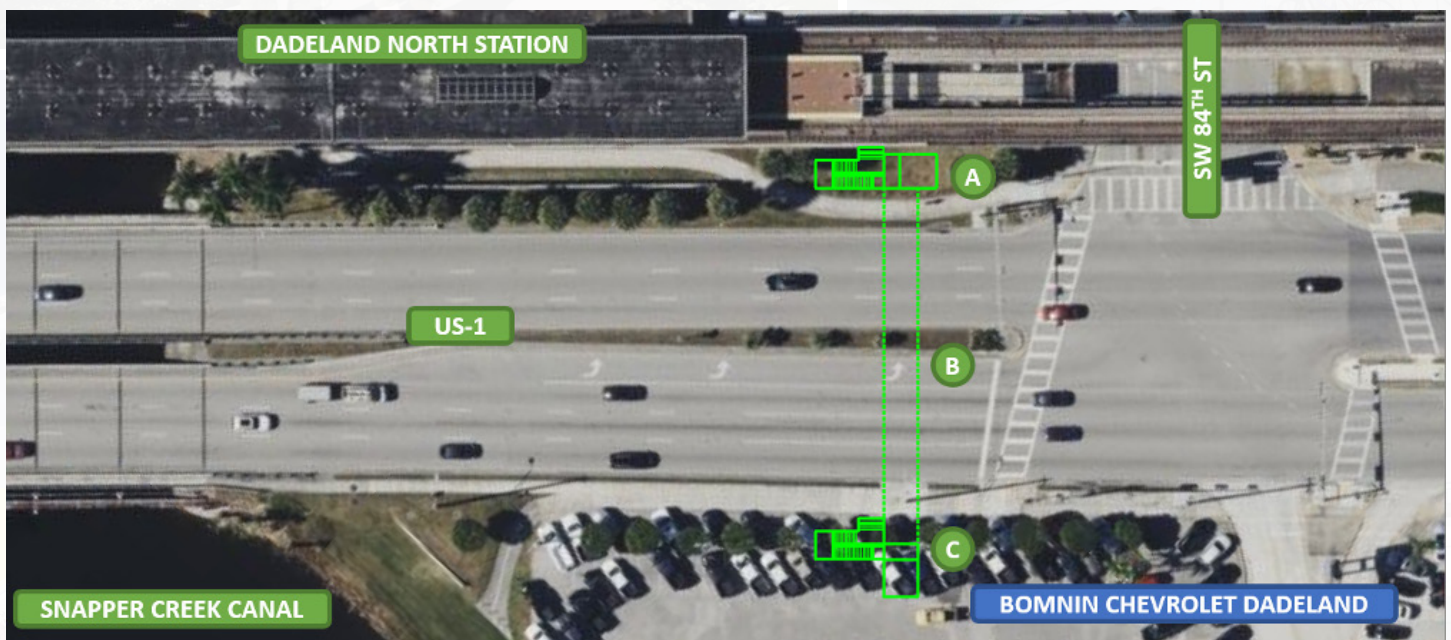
Dadeland North Metrorail Station Alternative 2 Bridge Location
